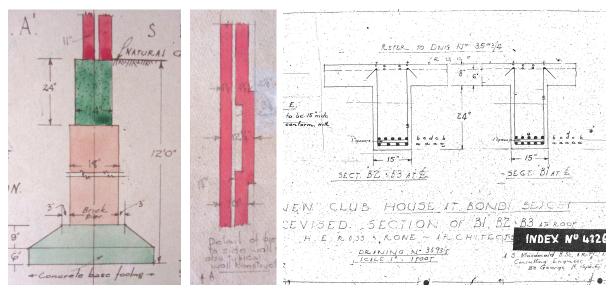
The original drawings show the 12'deep footing structure in section at left and the brick cavity wall structure in plan at right. Drawing conventions and notes indicate the concrete pale green/green and brickwork pink/red. The drawing at right is the engineers' drawings for the concrete beams over the hall Source: WLS drawings Waverley Council Index No 432619 (left and centre) but colour photographed Jean Rice and No 432603 (right)
